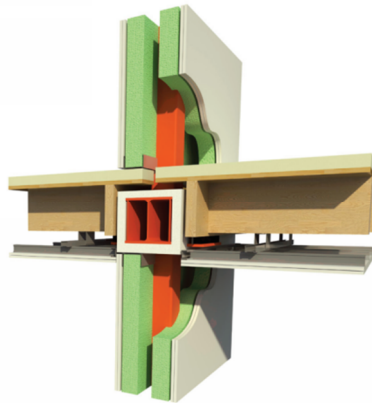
Karel Doorman - Detail of separated floors and walls (Hermens, Visscher, & Kraus, 2014)
